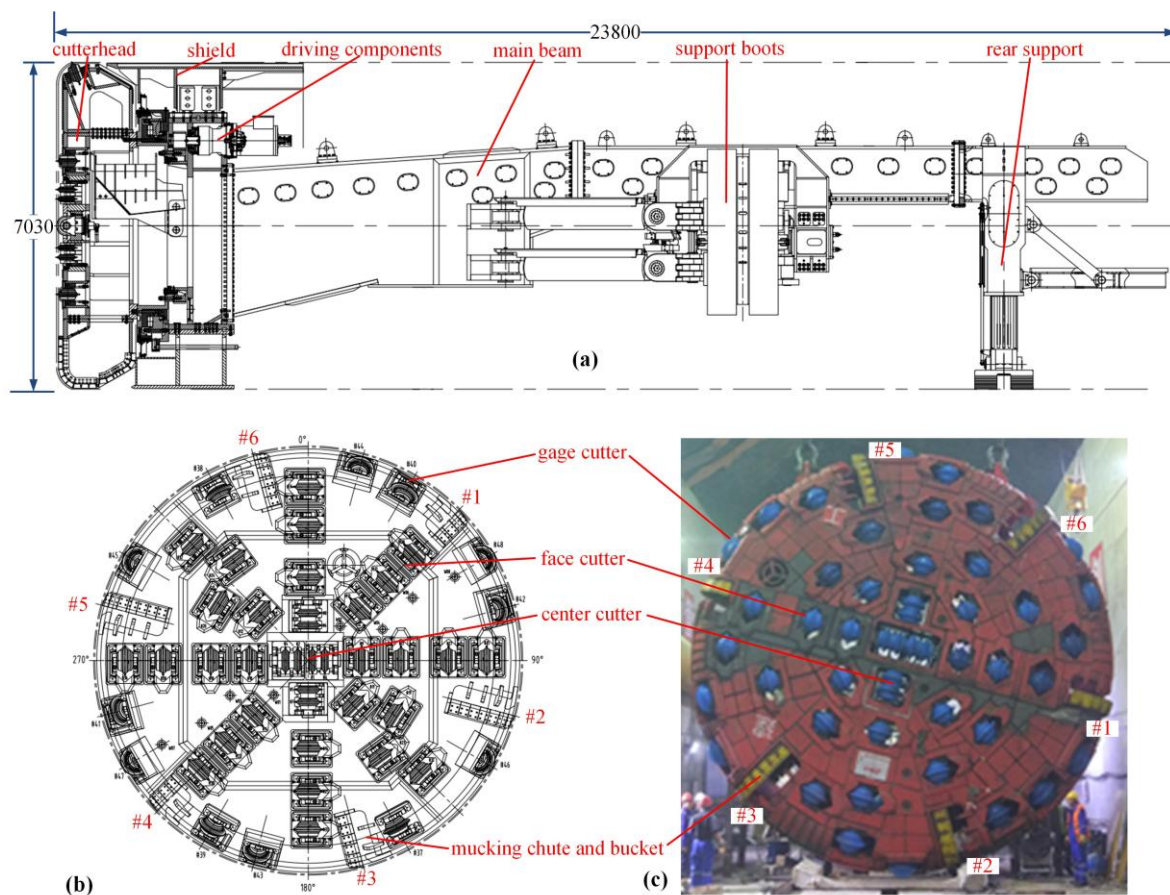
The applied ZTT7030 TBM, (a) the host machine, (b) layout of cutters and mucking chutes on the cutterhead, (c) hoisting and installation of the cutterhead on site.
